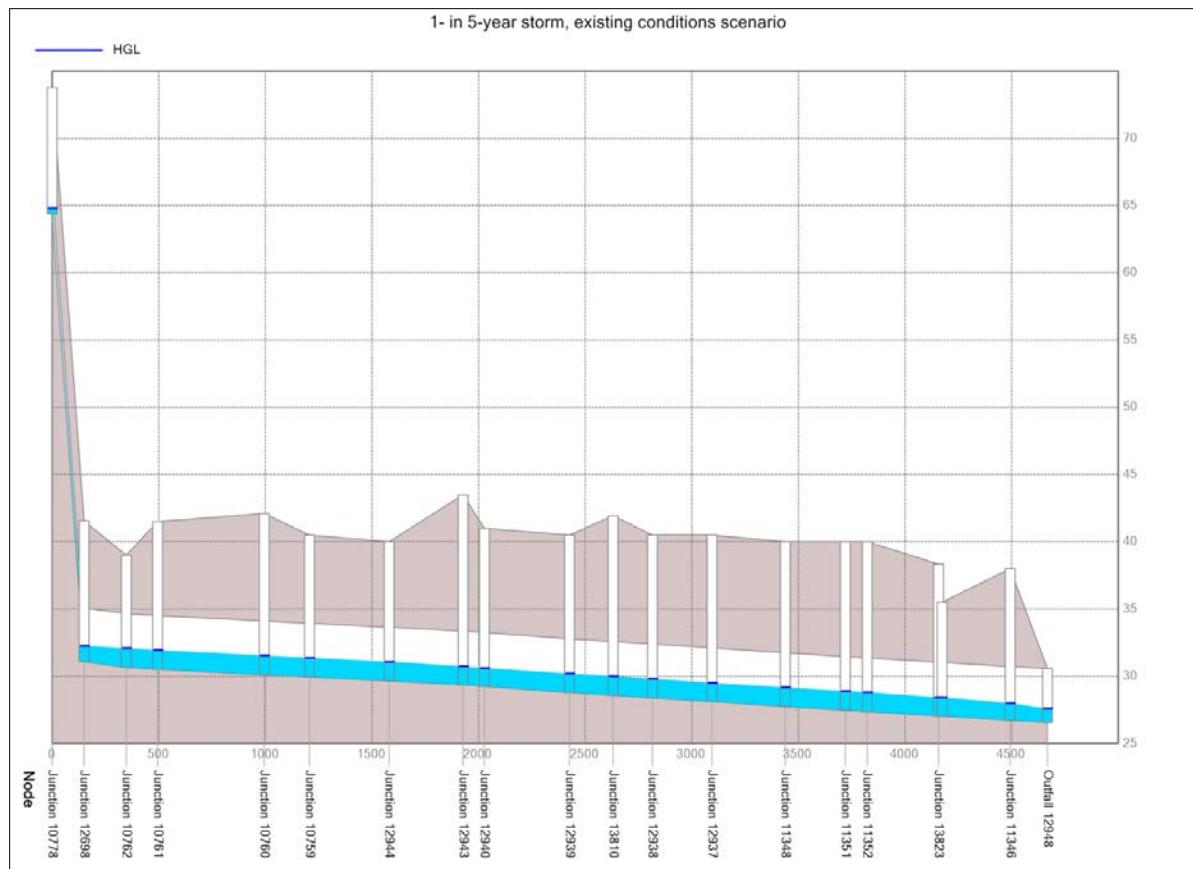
Sewer Profile – Highway 213 and Redland Road to Highway 99E
